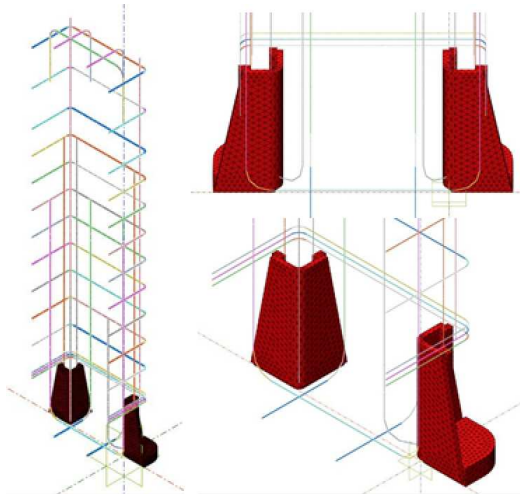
View of the column reinforcement in model and HPKM24 column shoes
